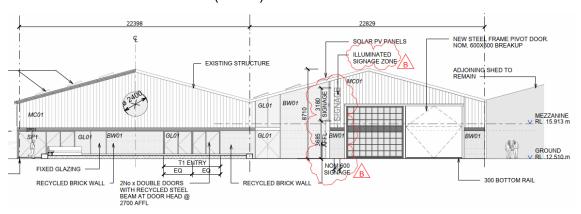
Elevation plans of signage, Source: Architectural plans (TP110 Rev B) by Six Degrees Pty Ltd
